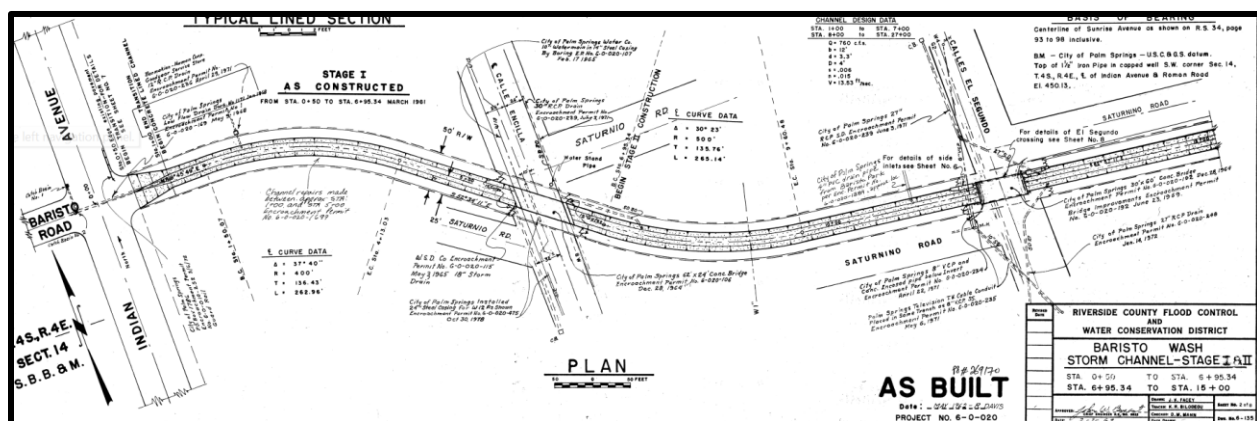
A Portion of the 1962 As Built Channel Plans
